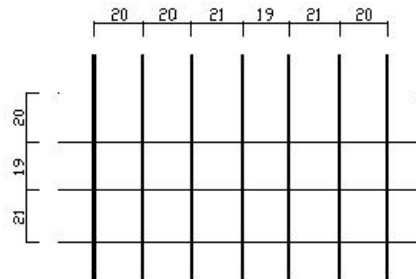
Pachometer test execution on the pier of bridge n°1.
